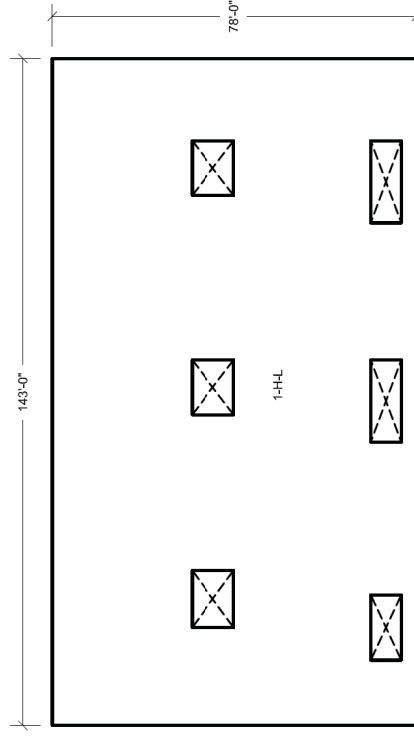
H-6-127: PUMP HOUSE FLOOR EL. 15'-2"
